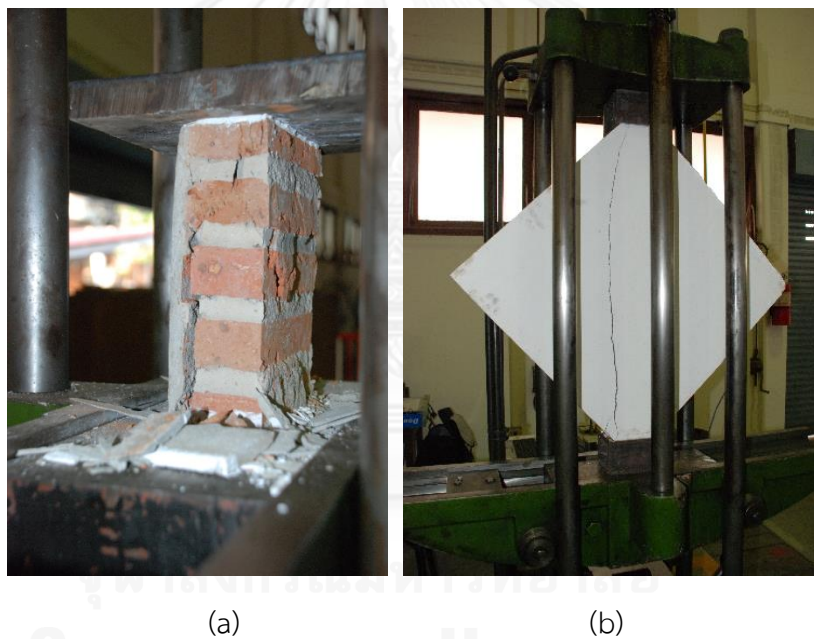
Failure pattern of masonry: (a) compression test of masonry prism; (b) diagonal tension test of masonry assembly
